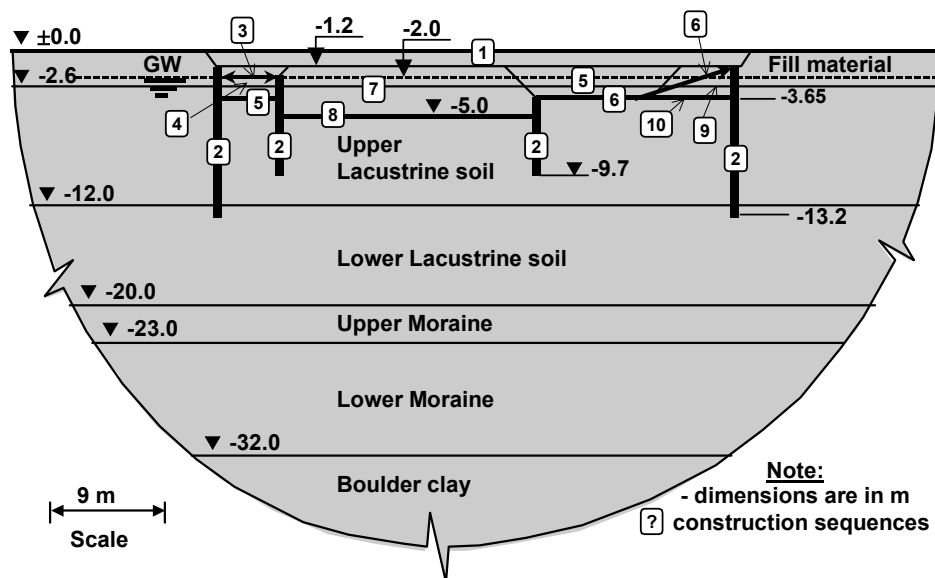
Section through the site (south - north), soil profile and construction sequence
